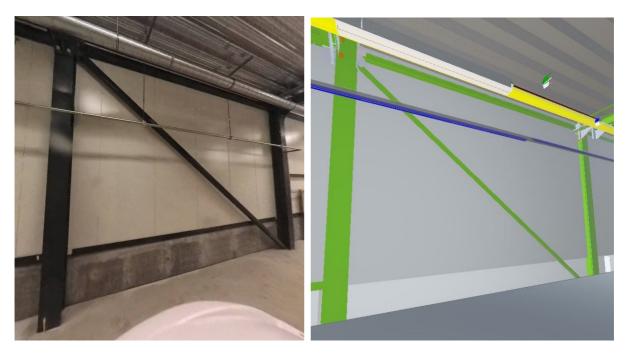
Site/BIM pair of a wall with exposed structural elements (steel columns, diagonal bracing, and overhead ducts)
